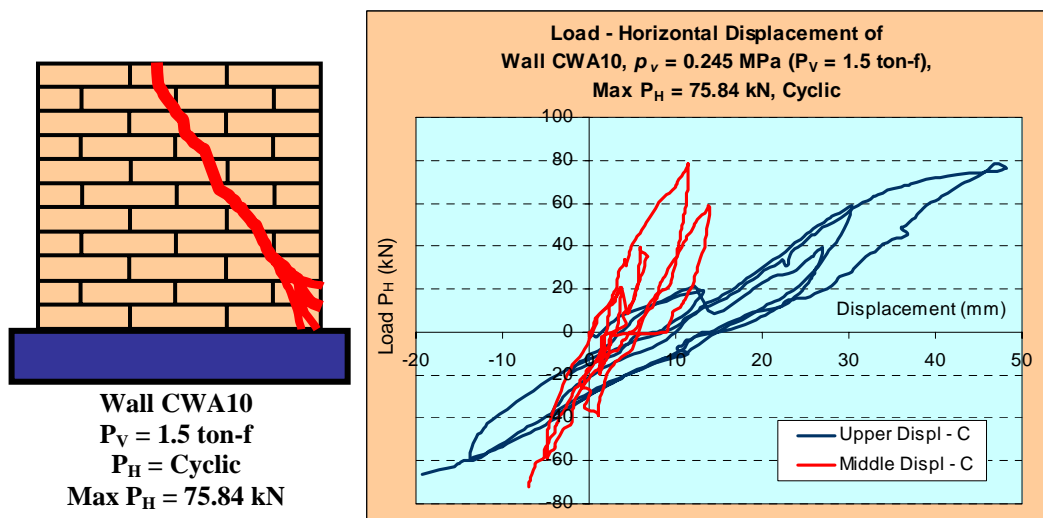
Failure pattern and load-displacement of wall CWA10
